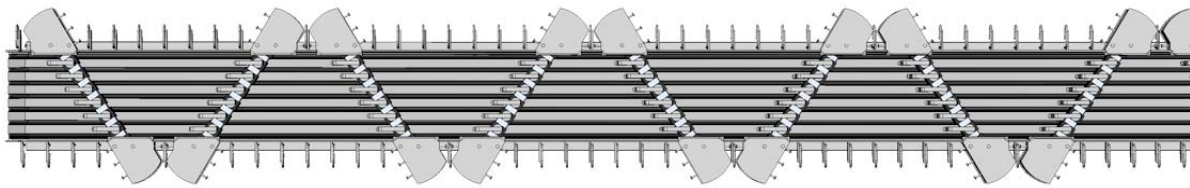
3D CAD model of a swivel joint expansion joint example in bottom view
